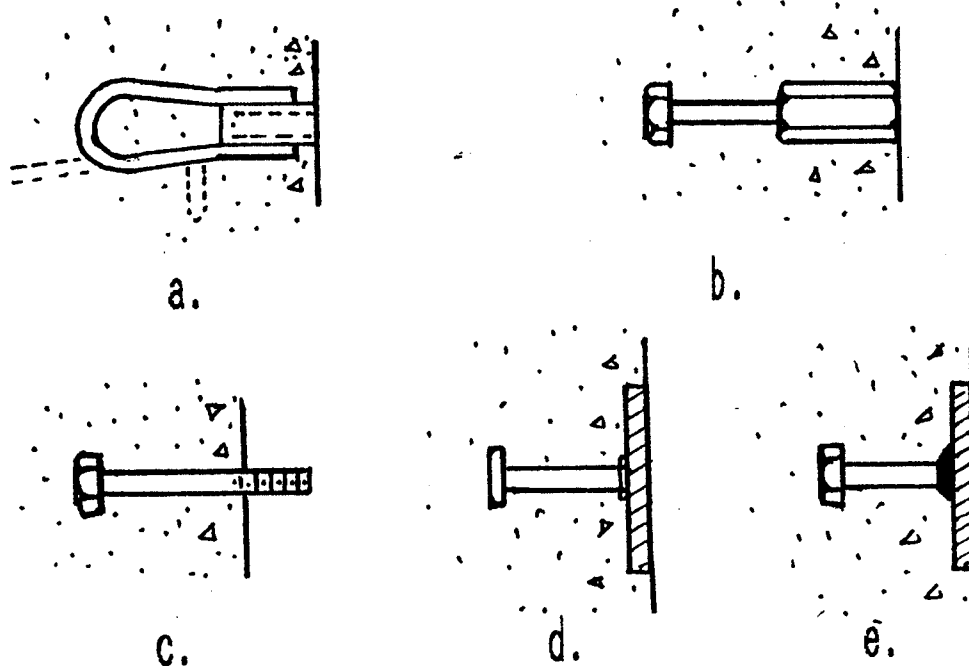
Typical concrete anchors (from McCann [1991]).
